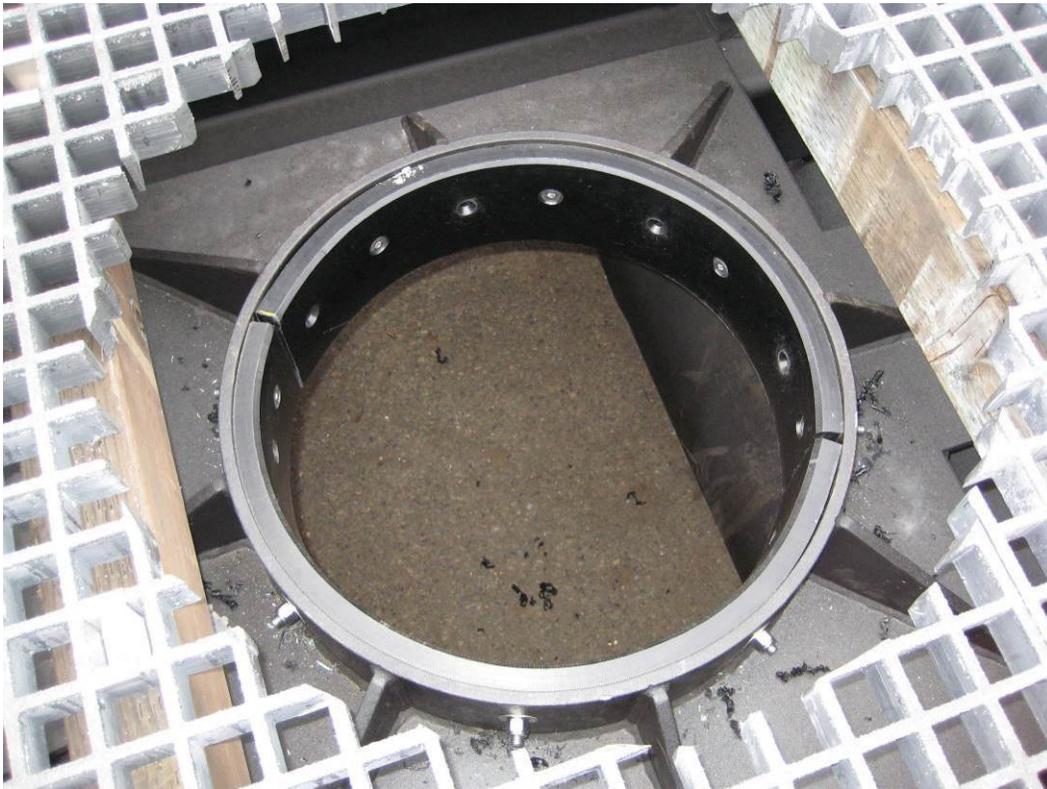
Pile Hoop Internal Frame (prior to final deck fit up)
